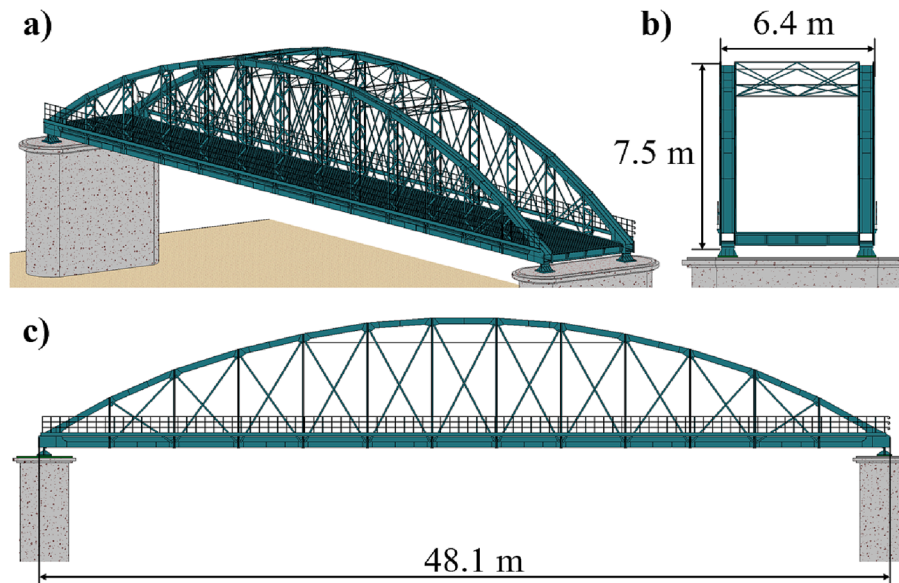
O Barqueiro bridge: a) isometric view (b) cross-section and (c) elevation view.
